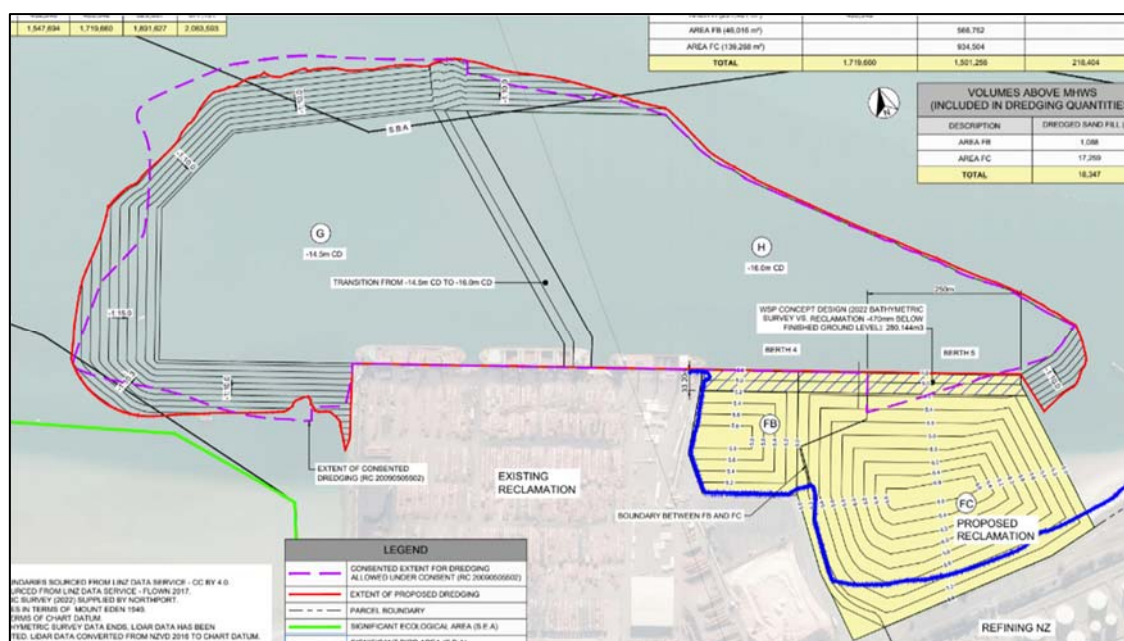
Plan showing extent of consented dredging areas (dashed purple line) and proposed dredging areas (red line) (source: Northport design drawings)
